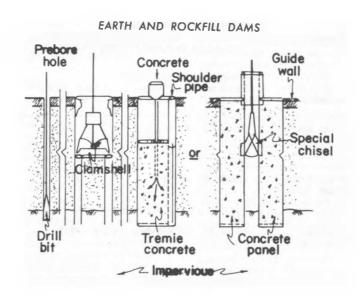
Steps in Construction of Concrete Cutoff Wall
